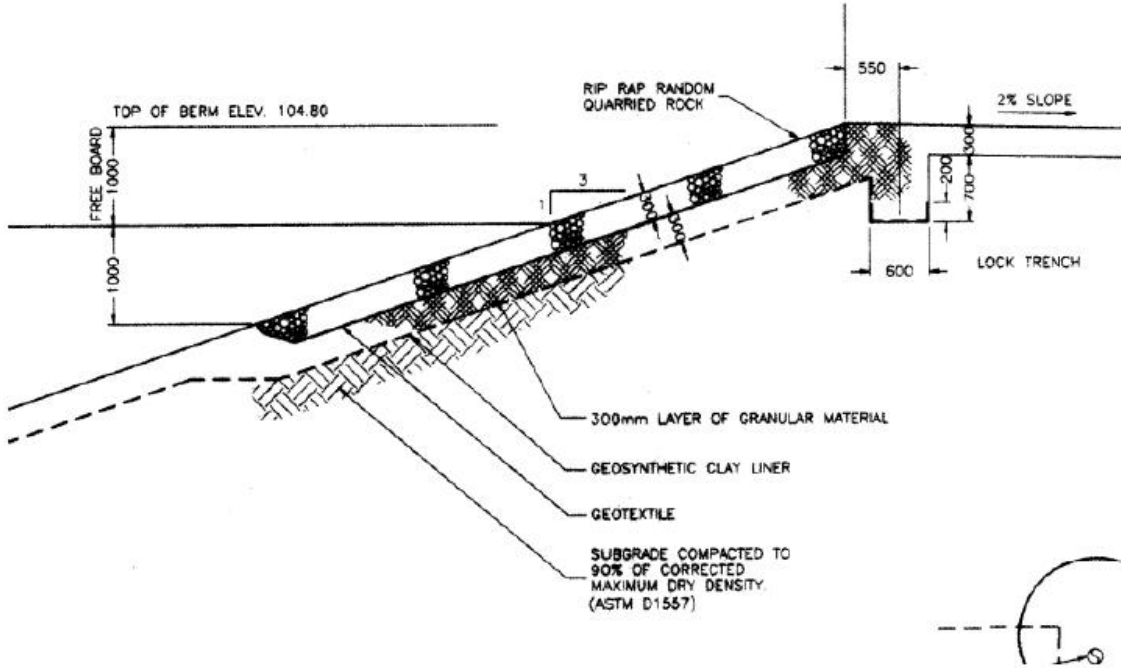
Typical Section Through Deer Lake Lagoon
